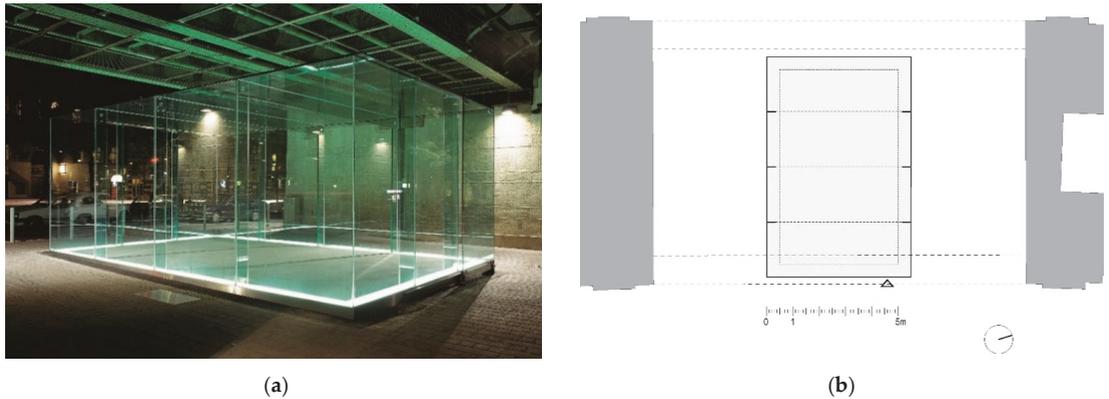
Export Pavilion in Wien: (a) view of the pavilion (© Rupert Steiner); (b) floor plan of the pavilion (© Architects Tillner & Willinger).
